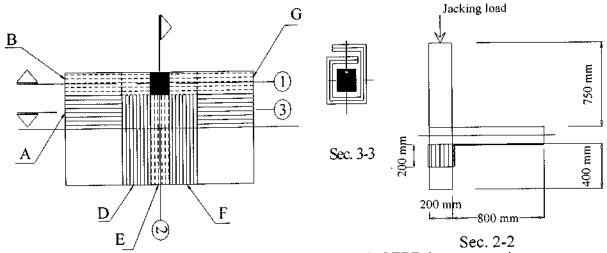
Geometry of Specimen S-6 with CFRP Arrangement
